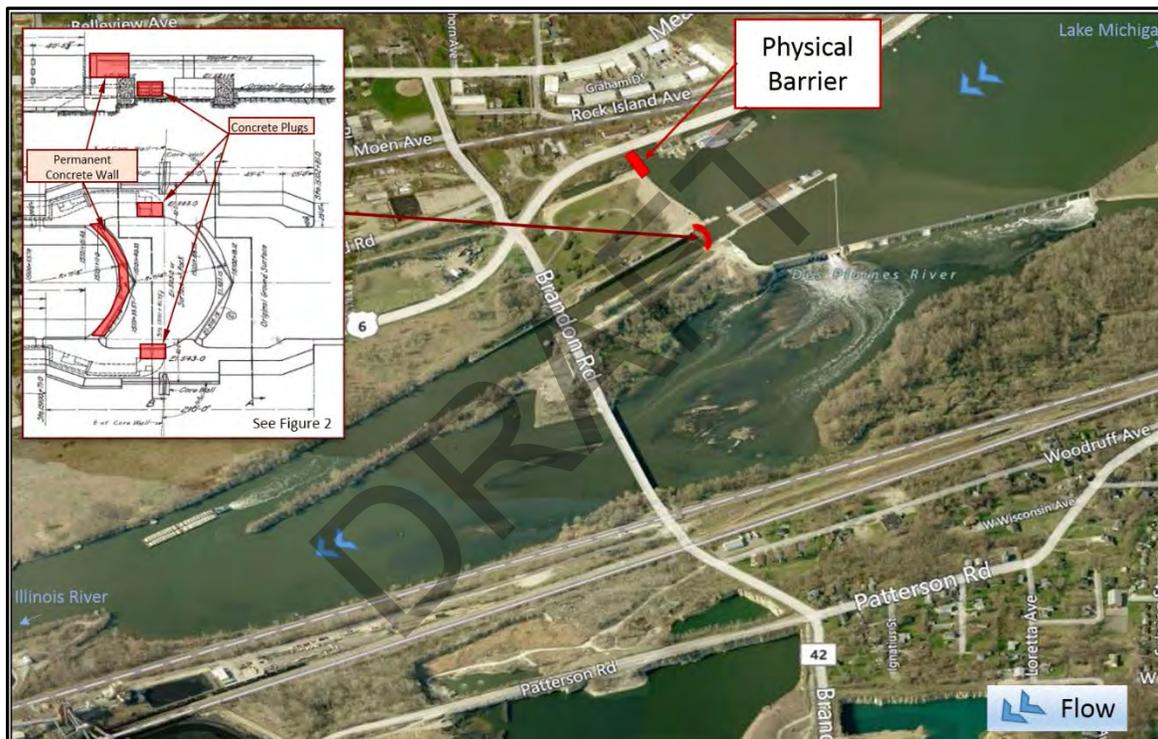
Aerial view of Brandon Road Lock and Dam with potential layout of Lock Closure.
